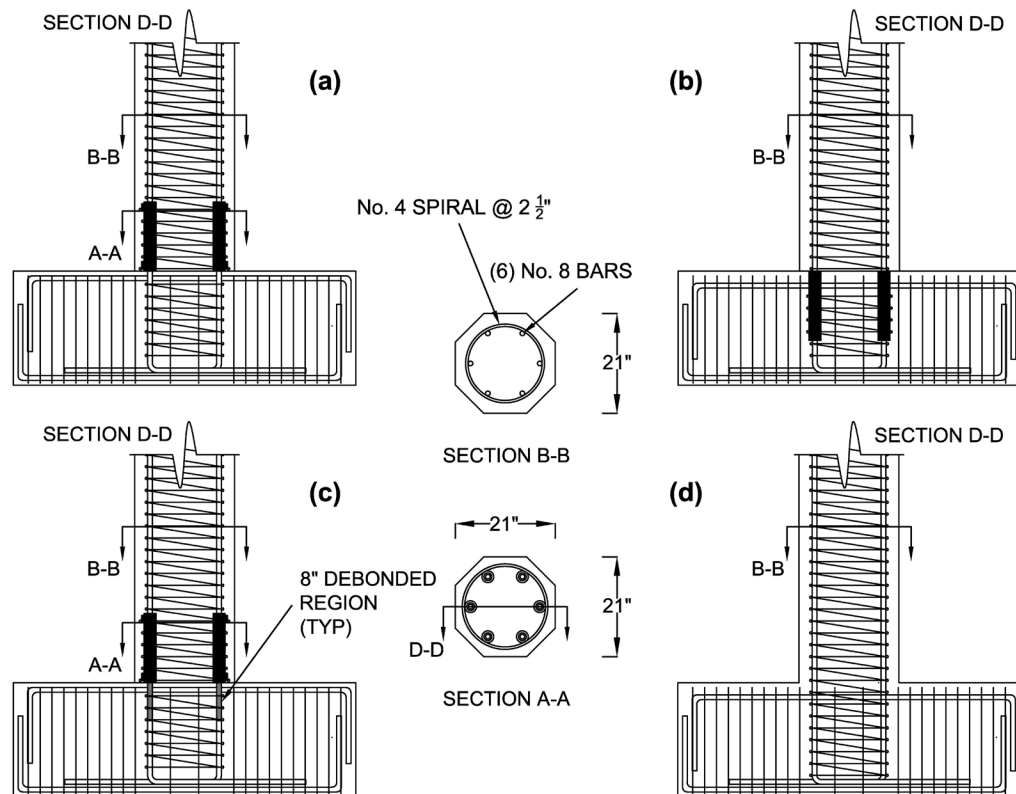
Details of specimens: (a) GGSS-1; (b) GGSS-2; (c) GGSS-3; and (d) CIP
